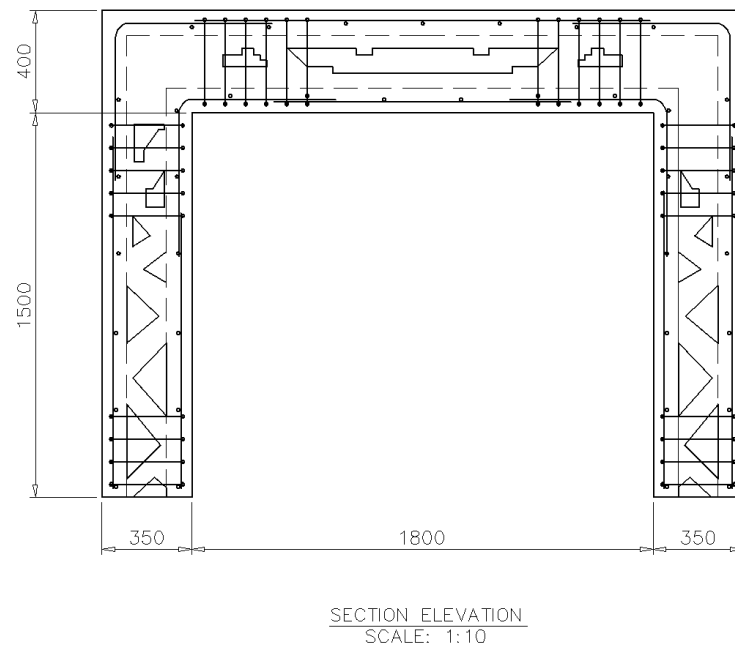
Optimised 1815 with trimmed voids and reinforcement
